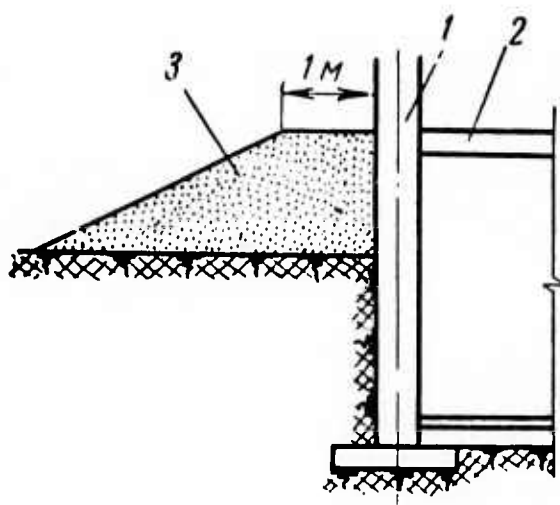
Shielding a half basement with earth: (1) wall; (2) ceiling; (3) shielding.
